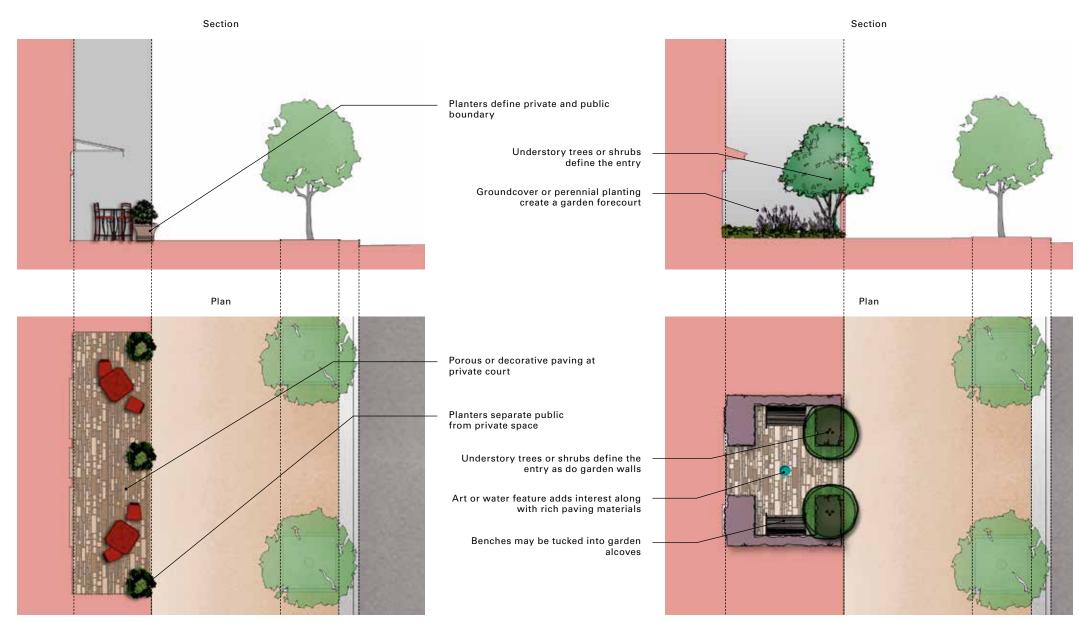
Typical commercial frontage with at grade terrace showing proposed planting in plan and elevation
